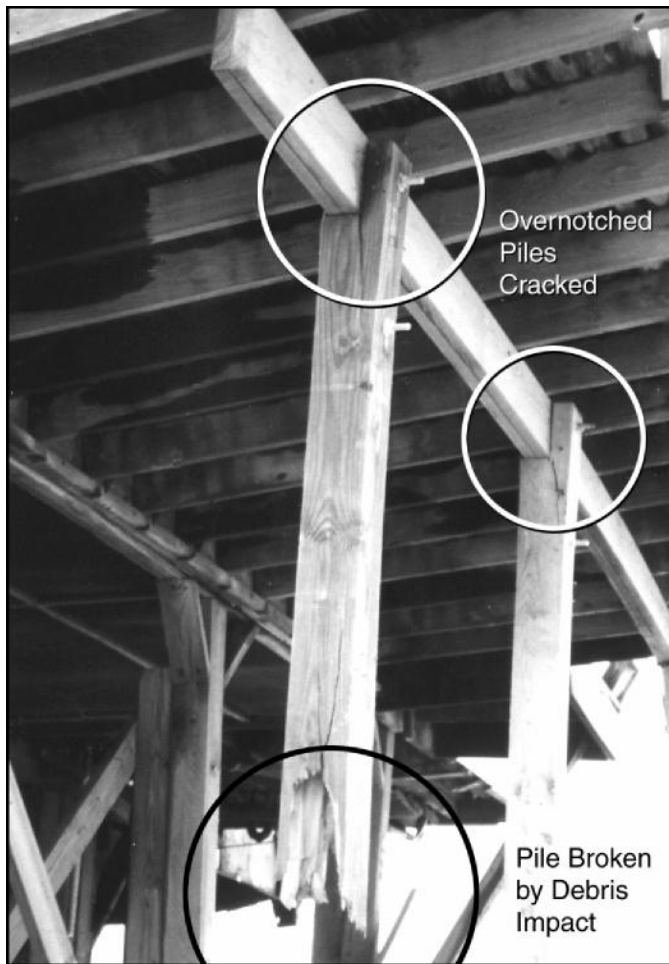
March 1989 nor'easter. Deck pile broken by debris impact. Flood forces also caused piles to crack at overnotched connections to floor beam.
